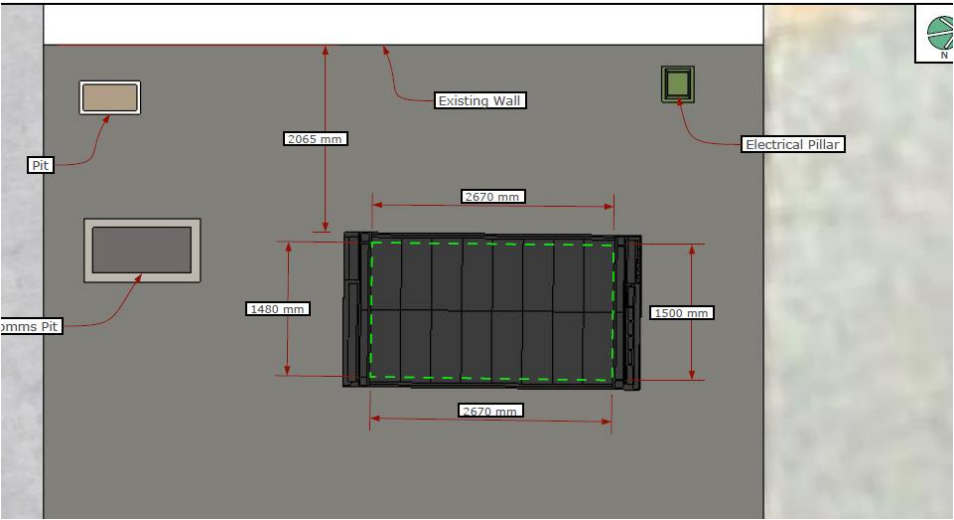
Proposed substation plan and dimensions (Source: Jolt)
